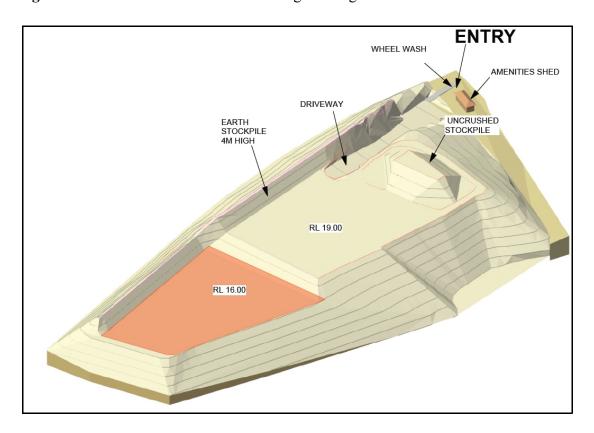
Extract from the 3D model of Stage 2A. Full details are provided on Drawing No.15, Issue E of the plans of the proposed development at Appendix 9.
